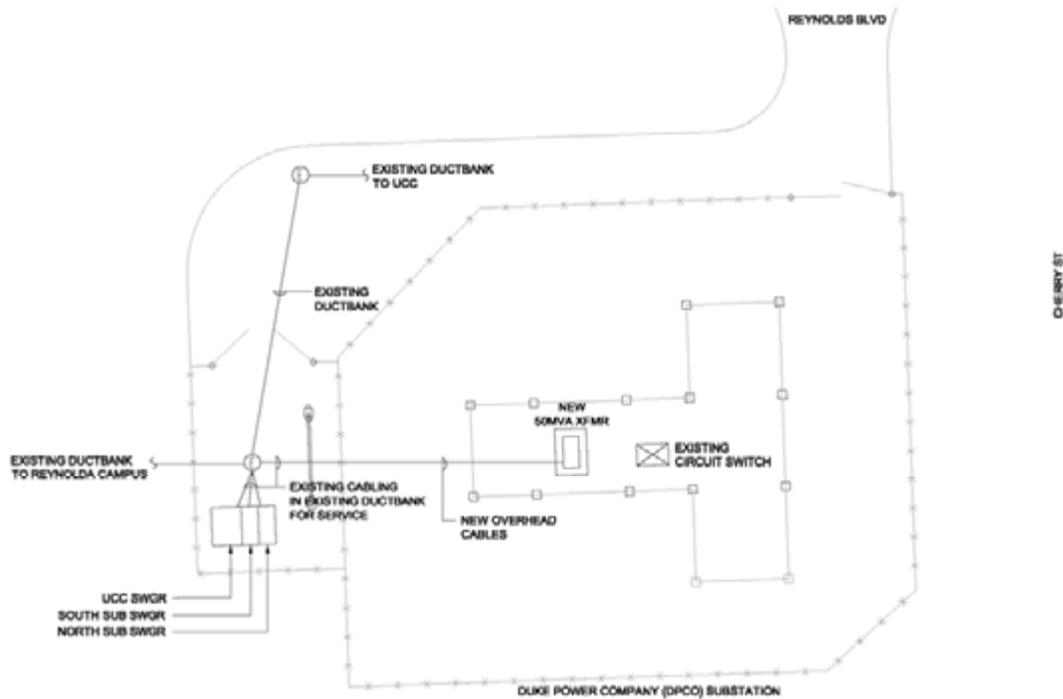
Option #2 Equipment Arrangement at Cherry Street Substation.
